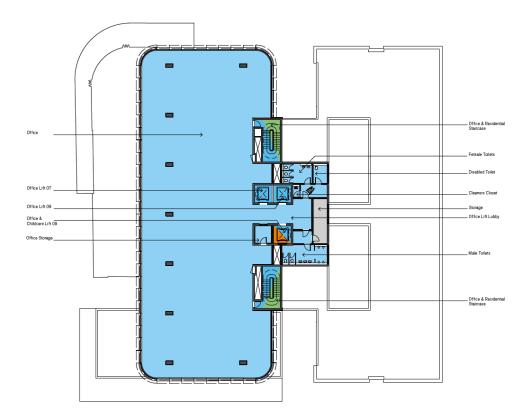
Commercial floorplate layout *Source: Foster* + *Partners
